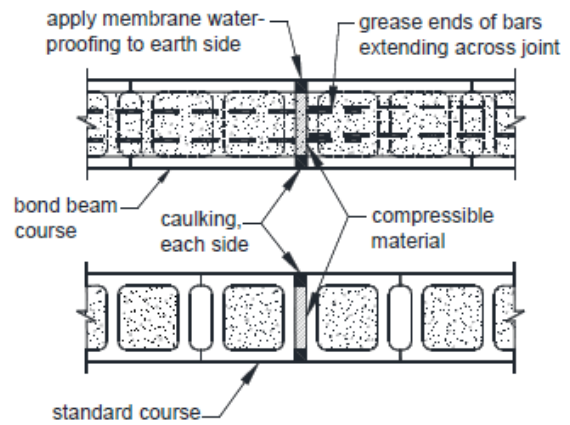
TYPICAL CONCRETE WALL SECTION
